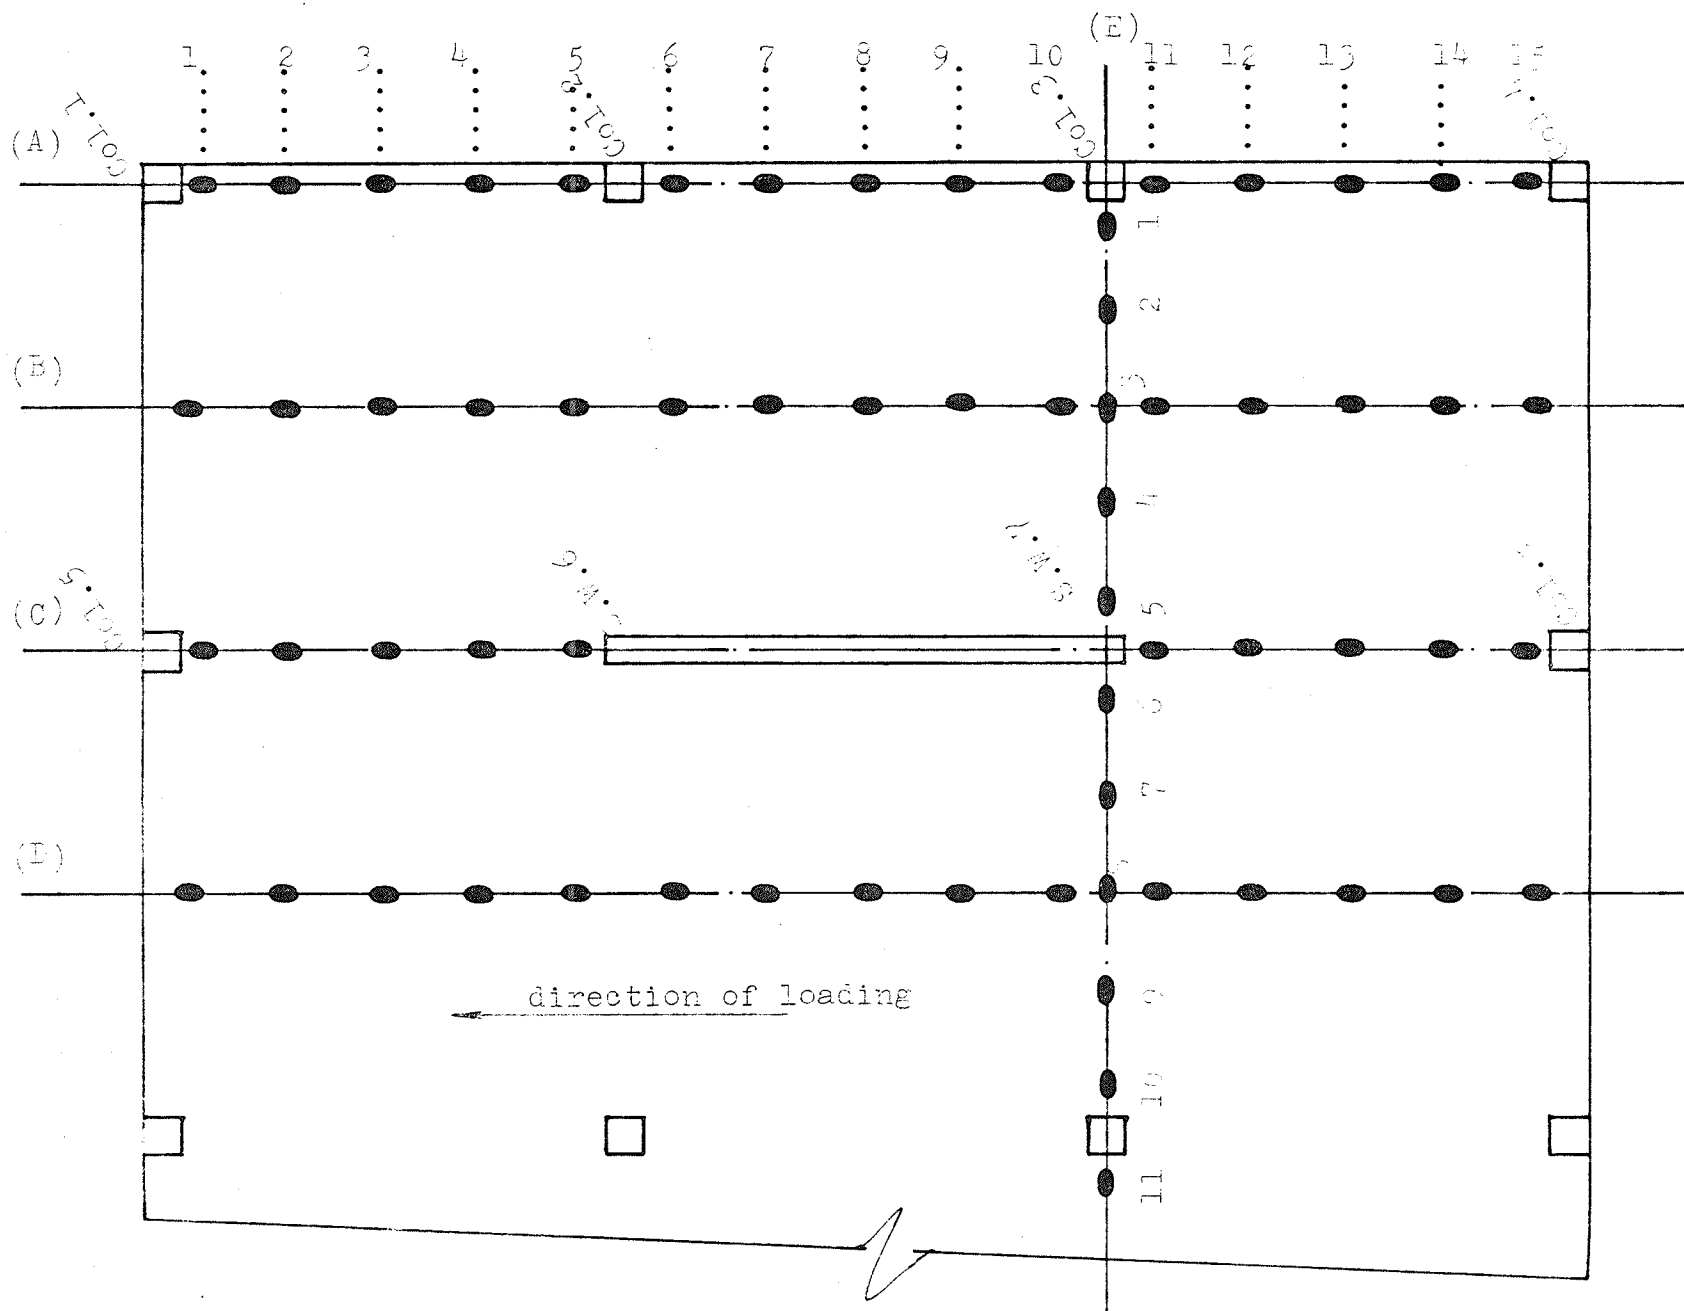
The location of electrical strain gages on plan view of floor slab at 9th, 5th, 2nd floor level.
